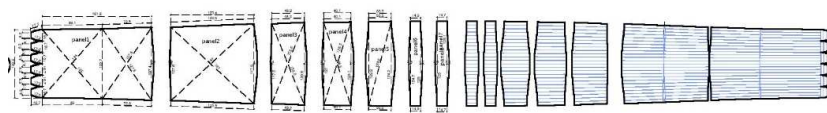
Inner tube patterning, plan and assembled view. (T. Herzig)
